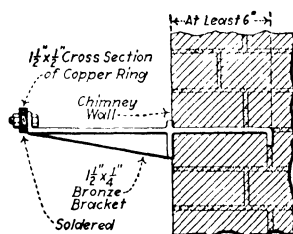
Anchor bracket for securing copper terminal ring to chimney wall.
